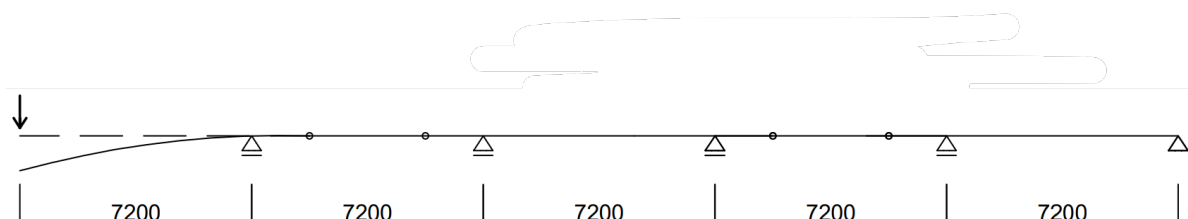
Corner column removed, Gerber beams supported by hinged connections
